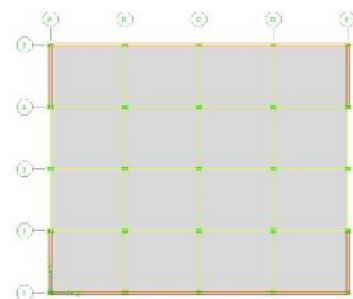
Plan of Model -3 (No wall between Grid 2-4 upto First Storey)
